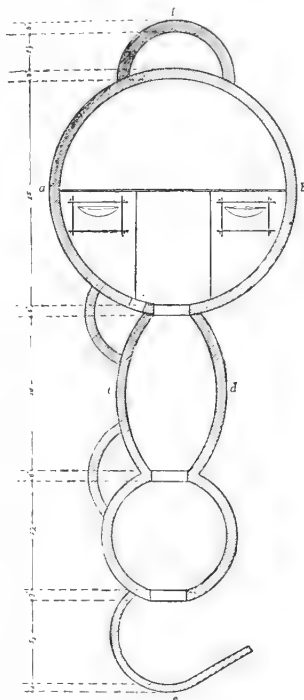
Ground plan of snow house of Davis Strait tribes.
